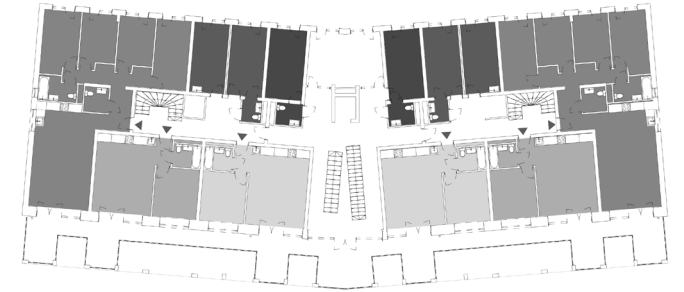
Apartments, Third Floor - Soubeyran / Geneva
